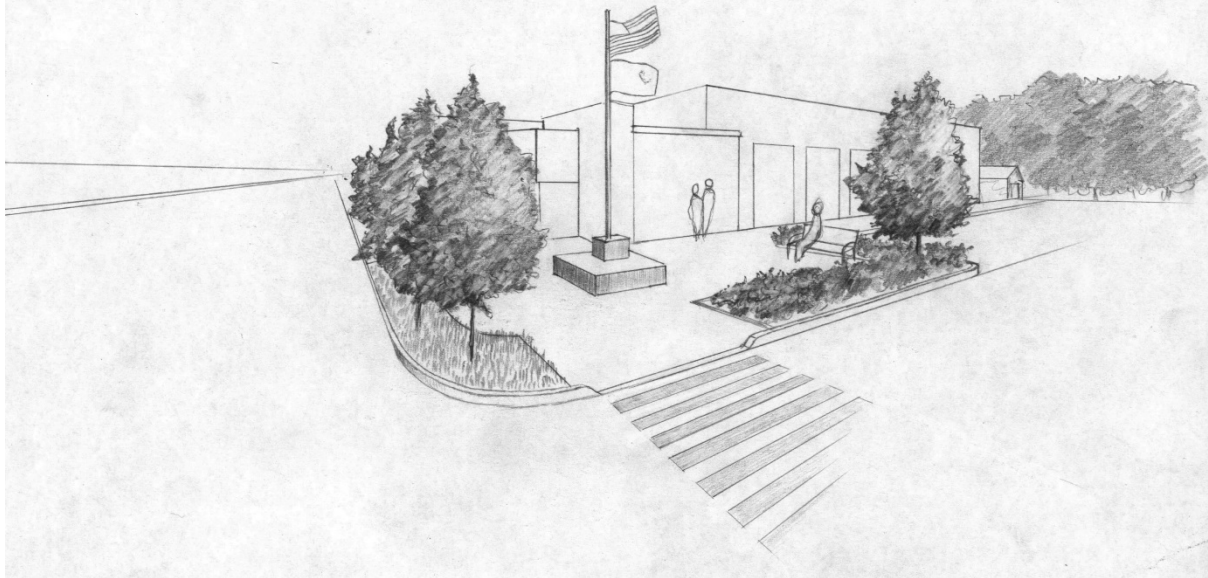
The City Building on the corner of Kasan Avenue and East 3rd Street could be enhanced through the development of a pedestrian plaza where off-street parking is currently located.
